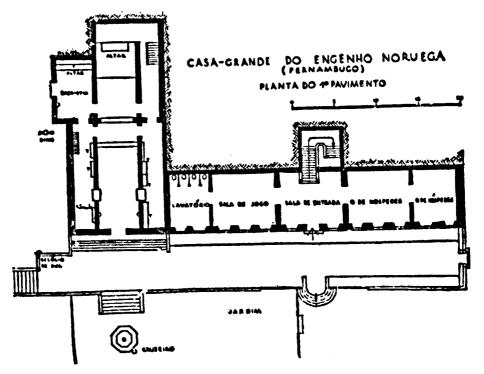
a sugar mill house plan - ground floor (Freyre, op. cit., 434)
